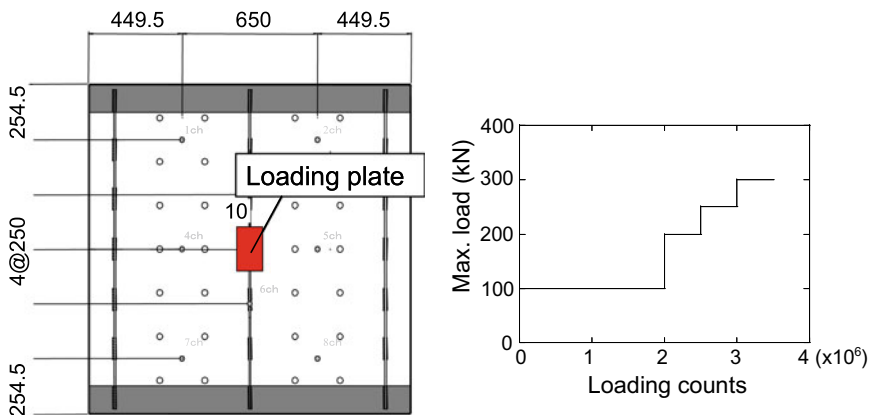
Steel–concrete slab specimen and fatigue loading steps
